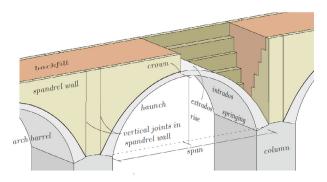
Terms in a concrete arch bridge, (Andersson, 2011)
